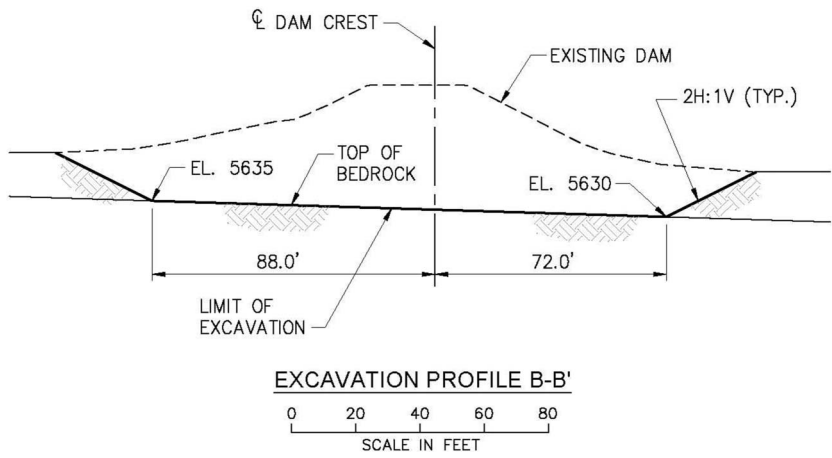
S-7. Centerline Profile B-B' for a Sloping Excavation
